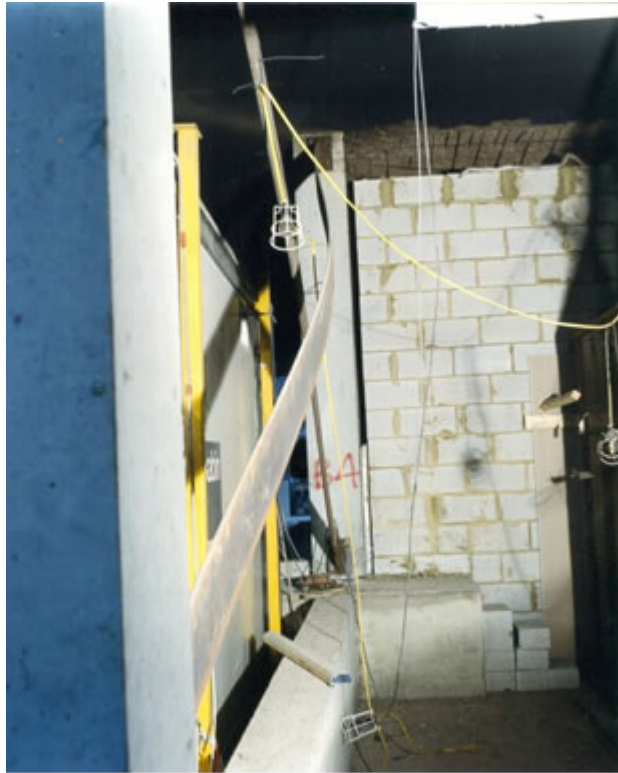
Buckling of bracing between columns B4 and B5 (similar buckling of bracing between columns C2 and C1 was also observed).
